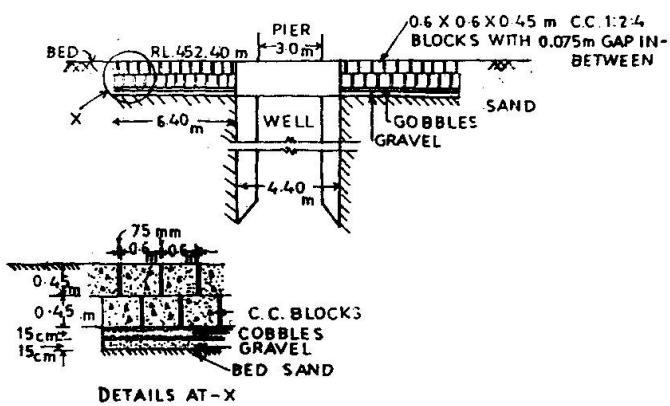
TYPICAL PIER PROTECTION AT TOKA BRIDGE
